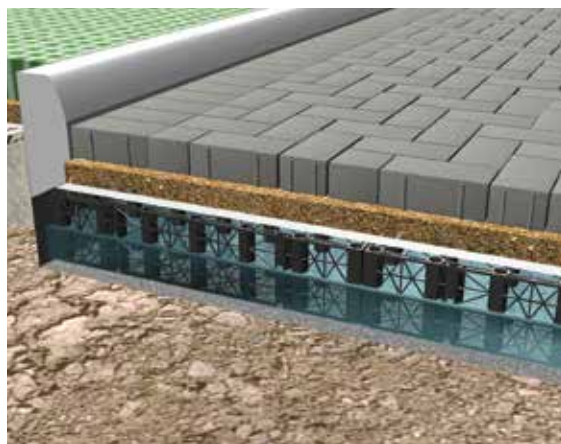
Concrete block permeable paving with geocellular sub-base replacement system (from Interpave, 2013)
